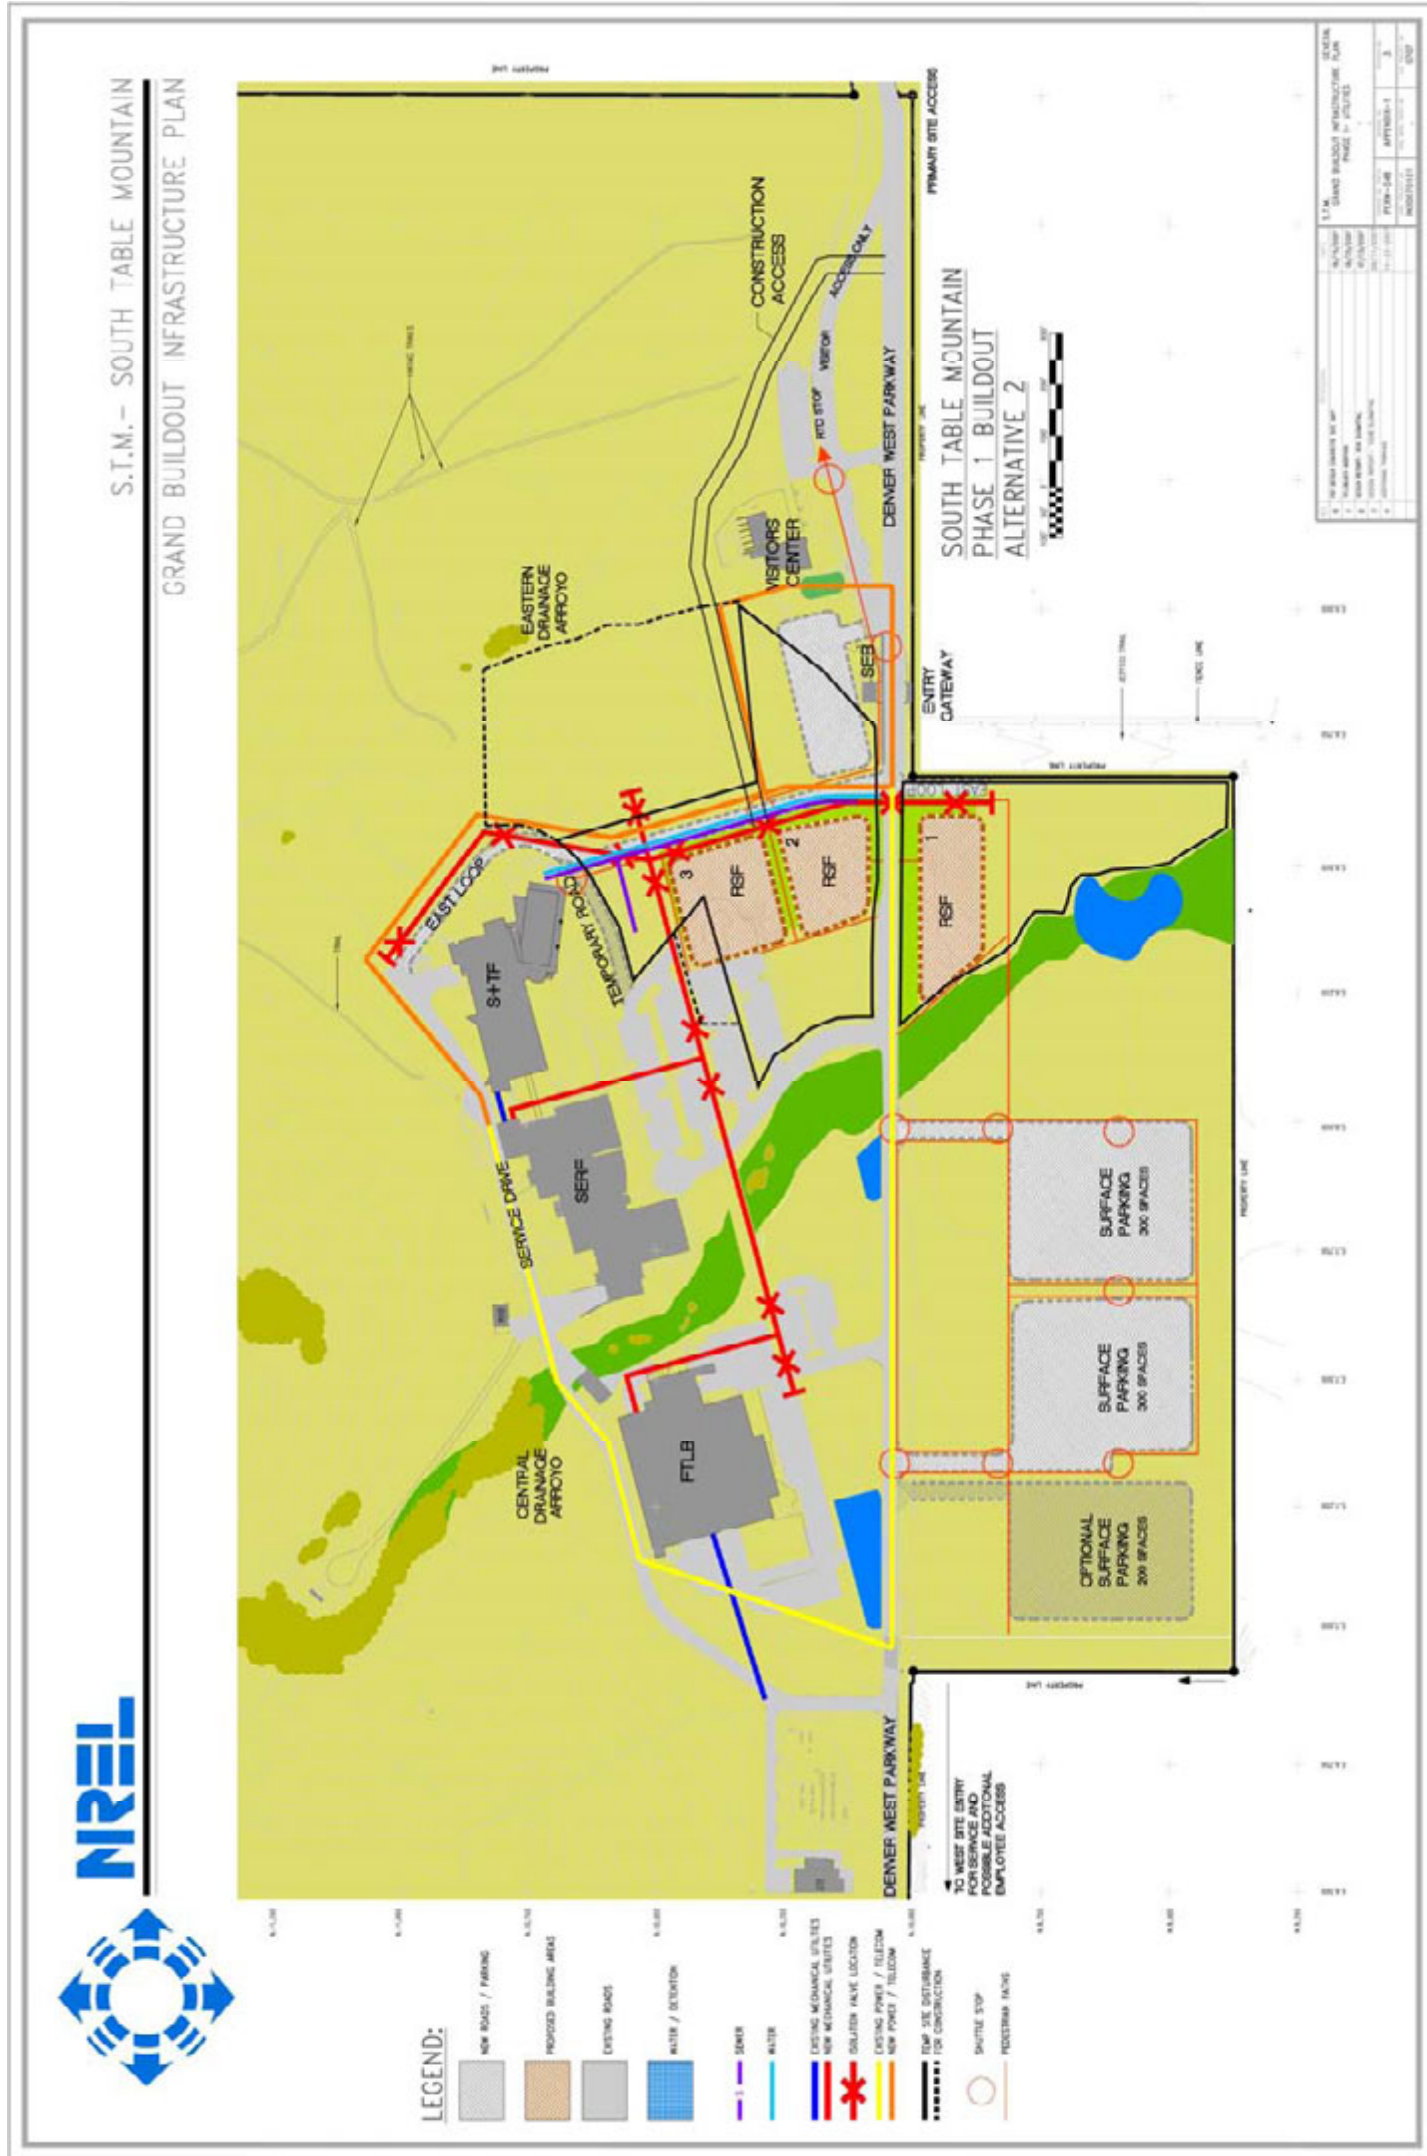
On-site Locations of Proposed Buildings and Upgrades
